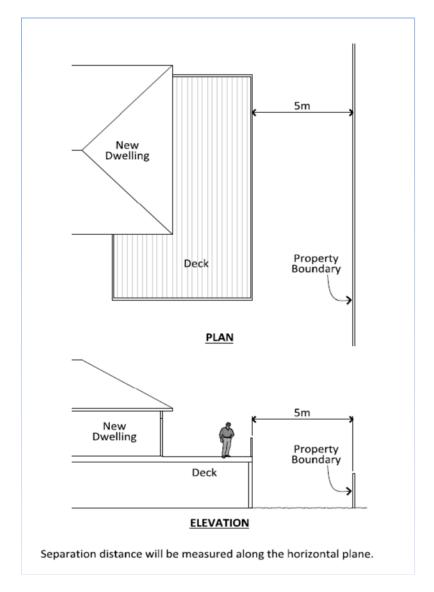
Upper-floor setbacks for separation and privacy
